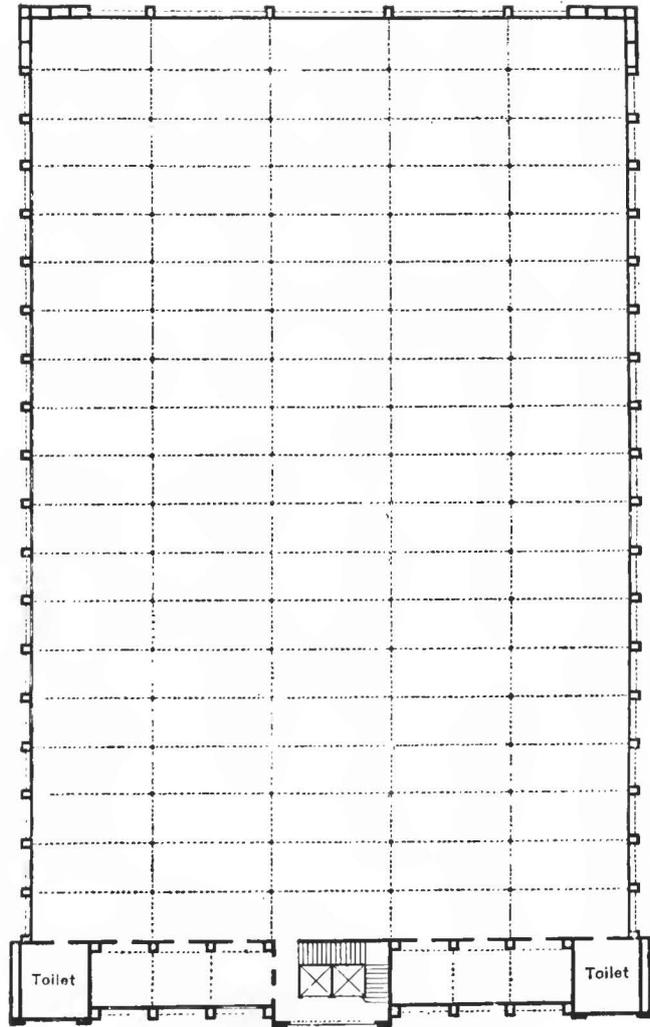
Plan. Scale 1-16 in. to 1 foot.
